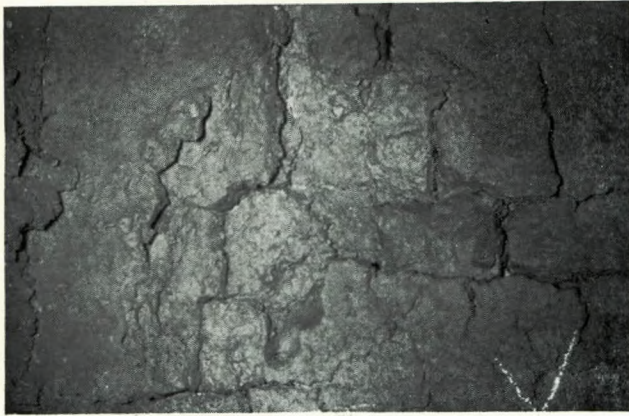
Spalling damage to rammed plastic refractory monolithic wall: twin furnace controlled superheat boiler
